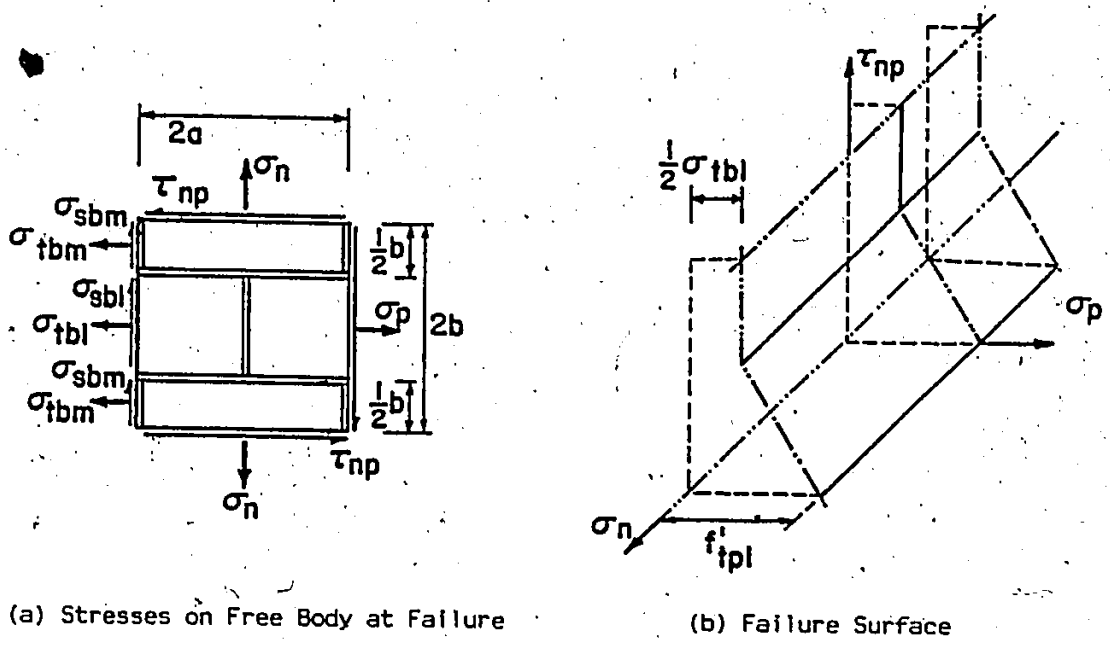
Strength of Masonry Assemblages in Vertical Splitting Through Head Joints and Units
